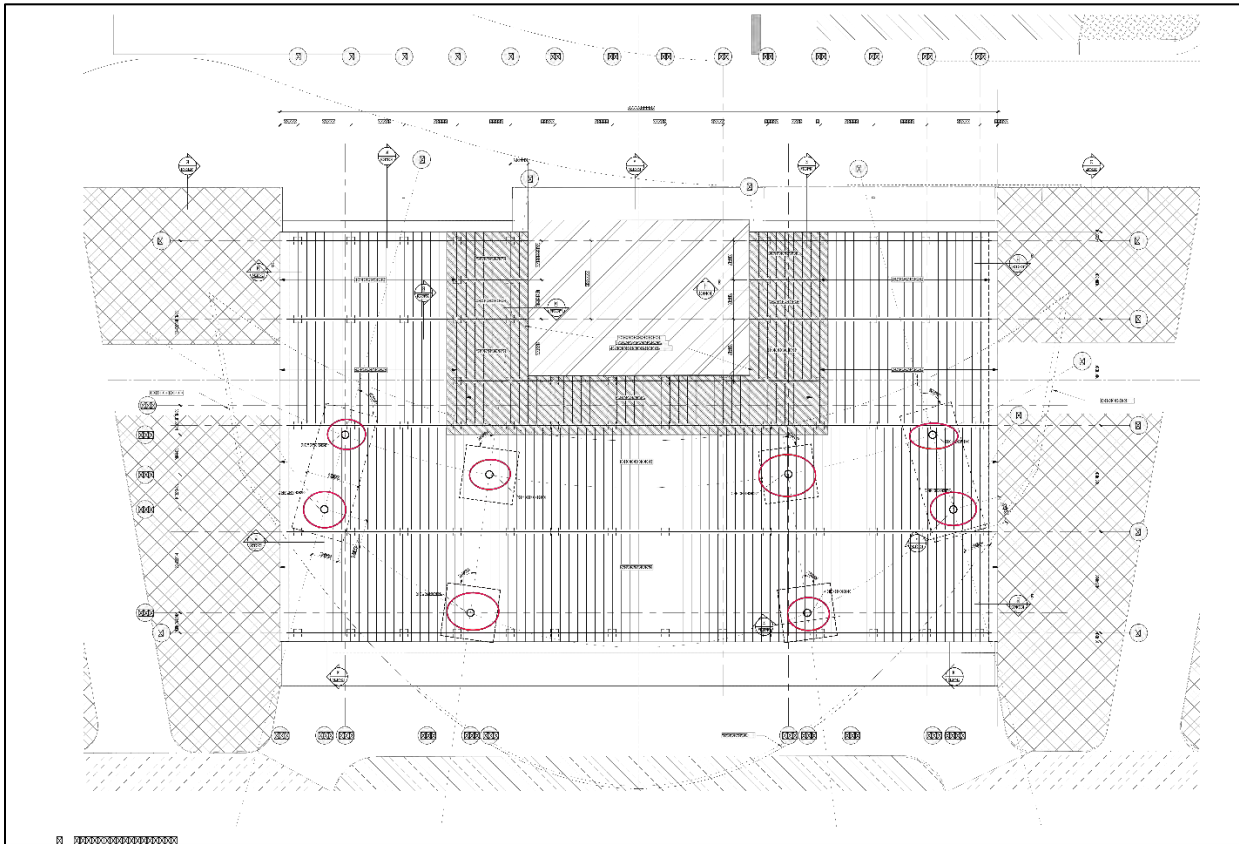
Design schematic of the pavilion and canopy foundation. Piers circled in red.
